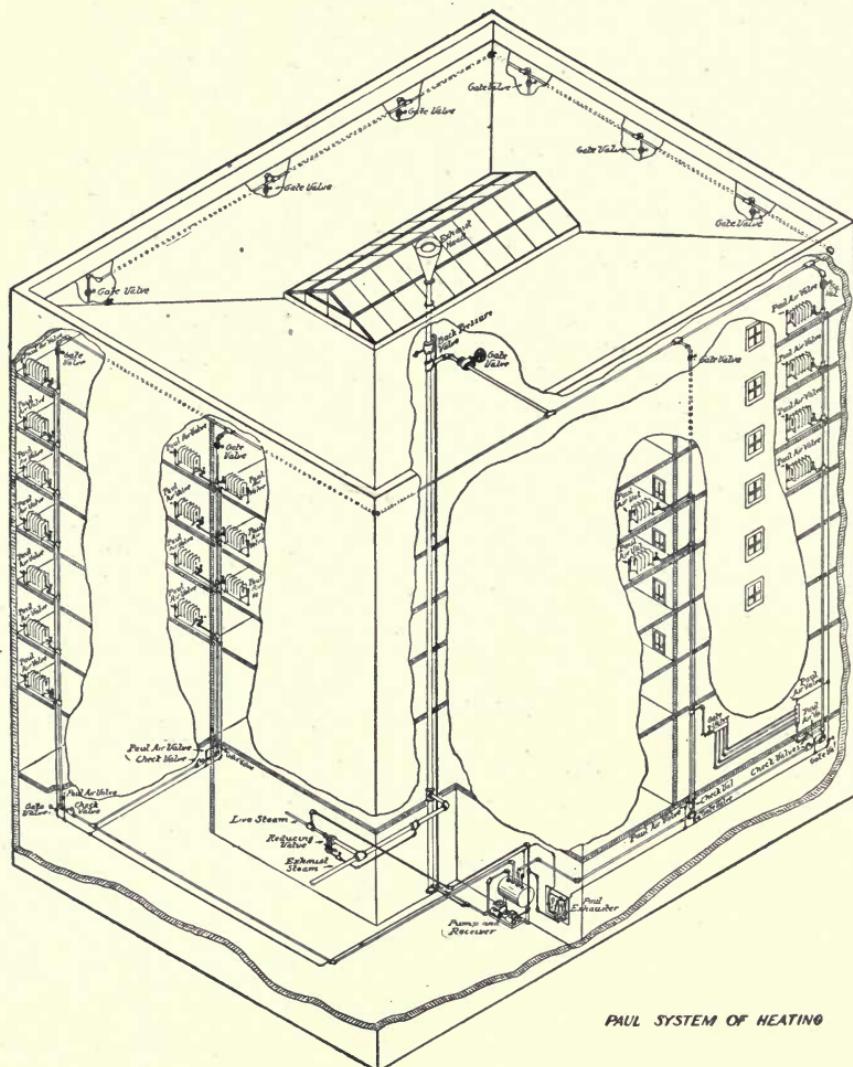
Showing General Method of Making Pipe and Radiator Connections in Paul System.
